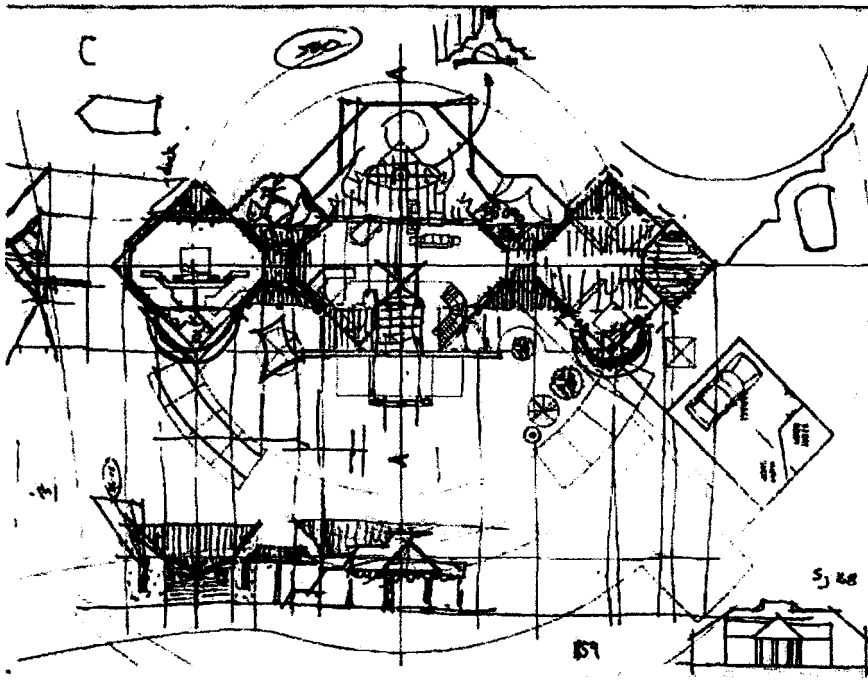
Overlay sketching of CAD drawing showing exploration of ideas
